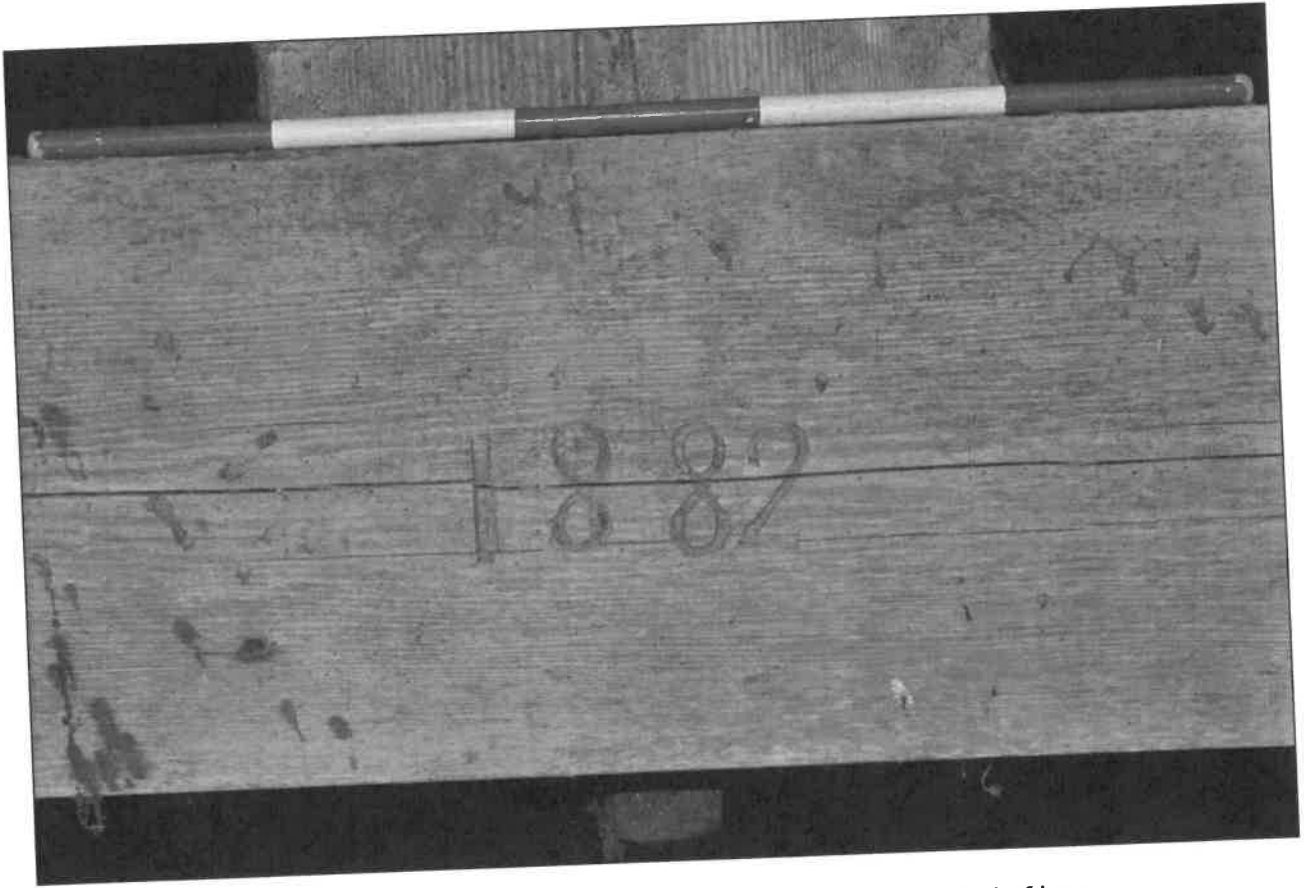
Date of 1882 on east side of roof truss in east end of barn
